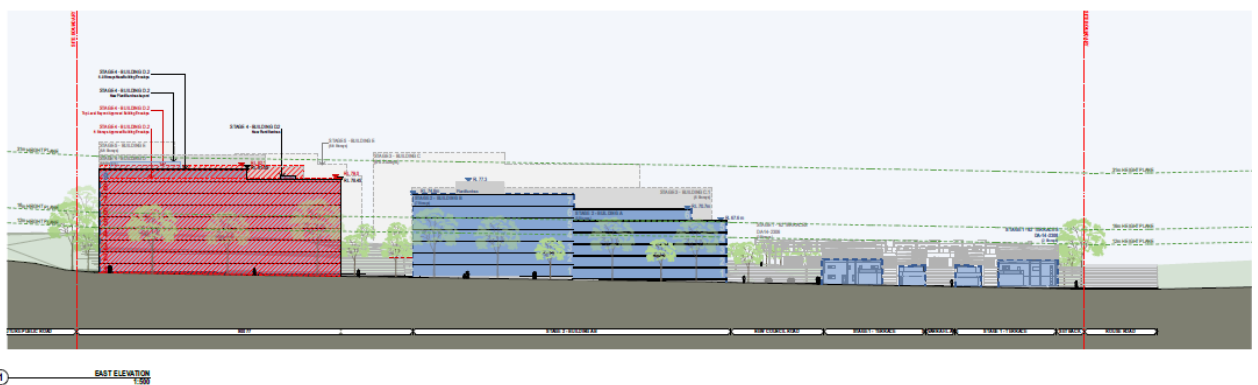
Extract from the Building Envelope Diagram showing entire site.
